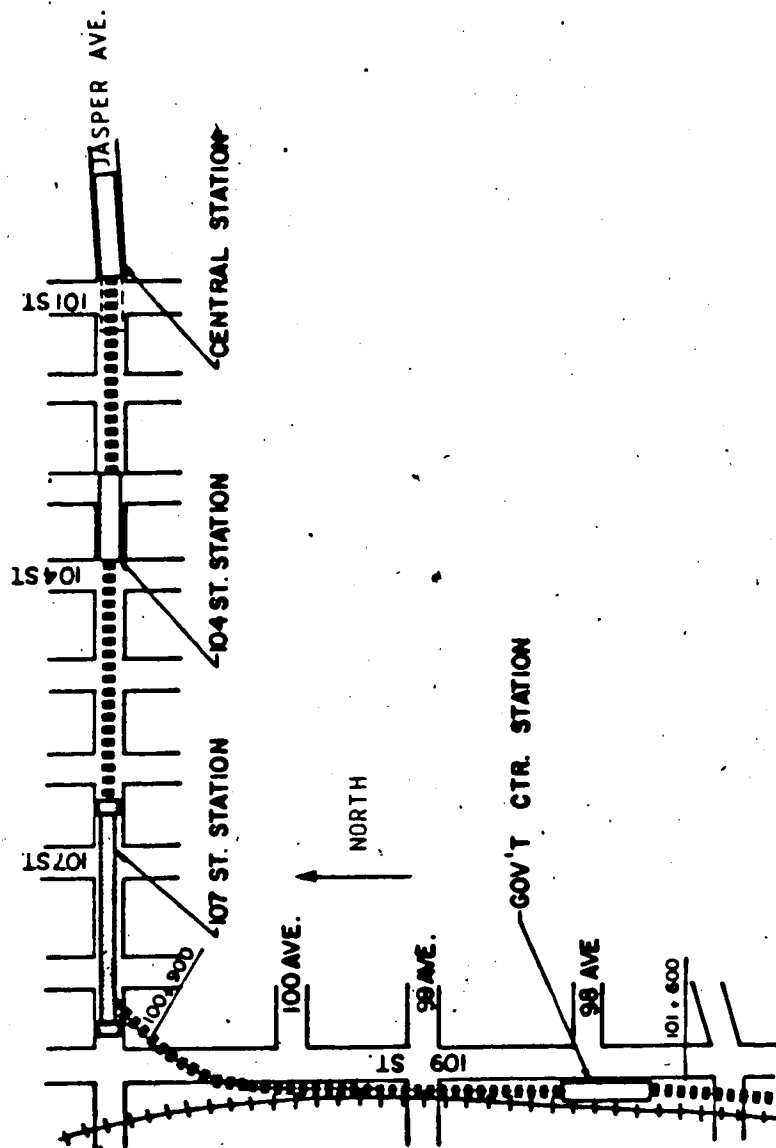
THE L.R.T. SOUTH EXTENSION - PLAN VIEW
